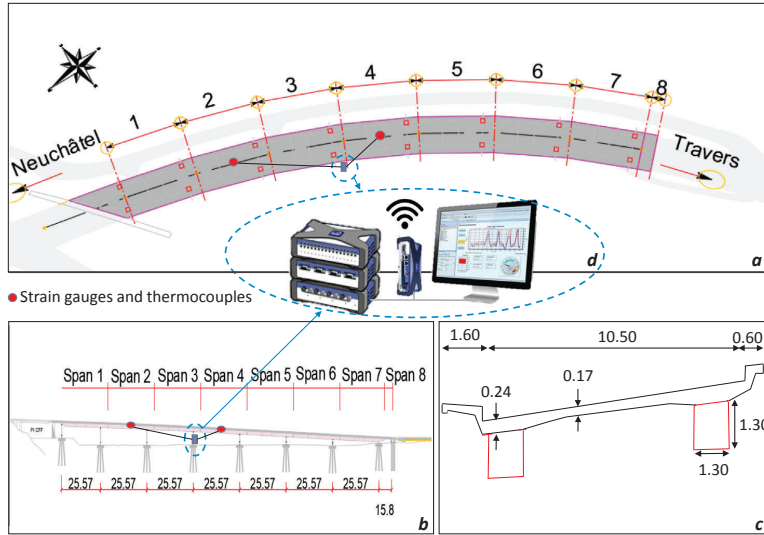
Drawing of the viaduct (a) plan view; (b) elevation side; (c) typical cross-section; (d) data acquisition and storage unit; dimensions in [m].
